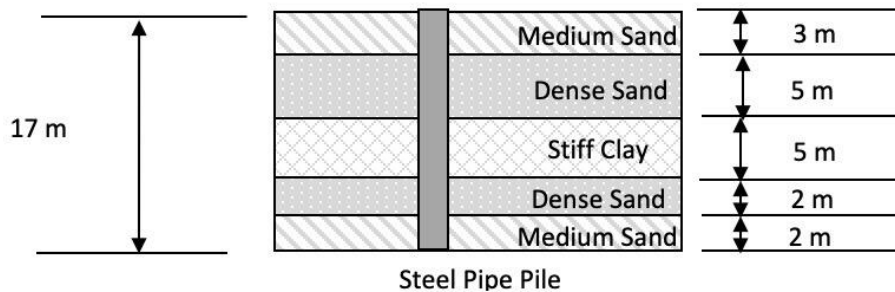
Soil profile along a 17 m embedded steel pipe pile
